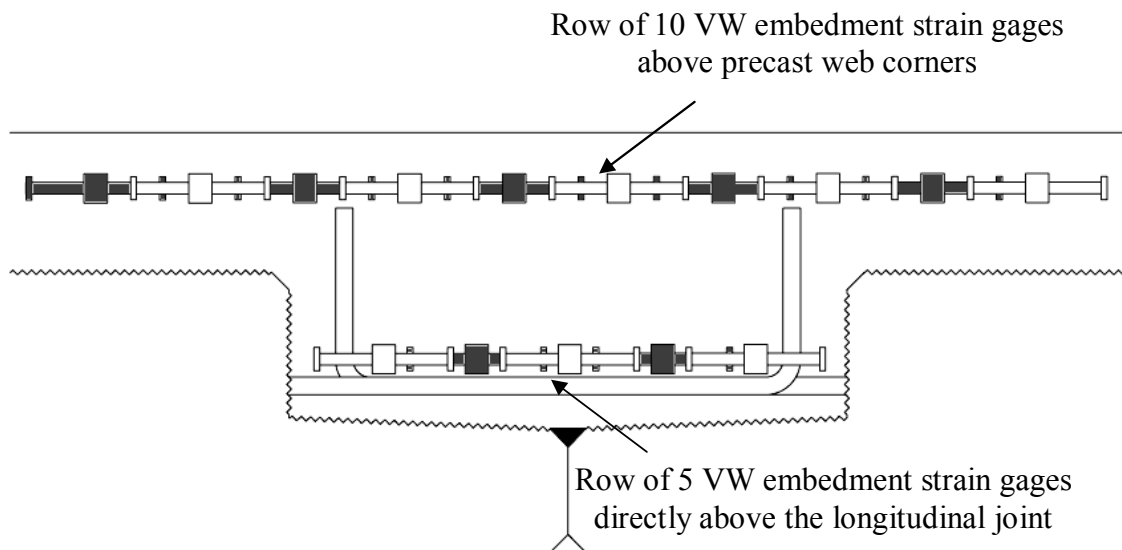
Cross-sectional view of instrumentation detail for VW embedment strain gages at each instrumented joint
